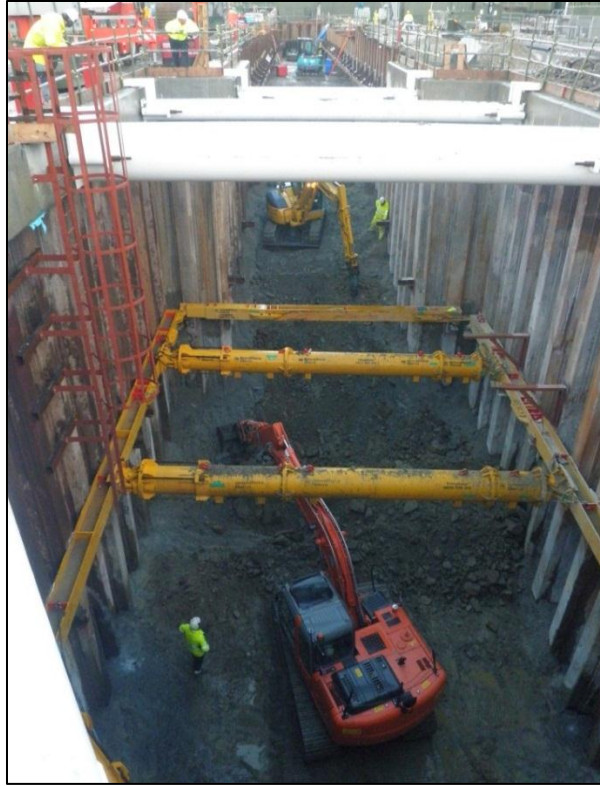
Aughooose: Bulk excavation of material from the tunnel starter pit & ramp, facing south.
